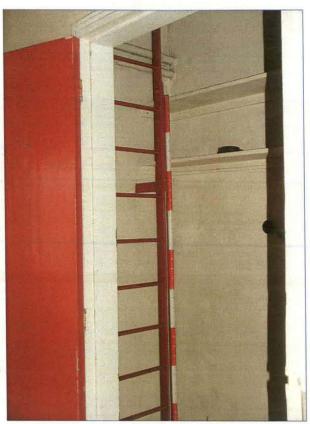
Metal ladder from second floor which provides access to the water tanks and roof (Scale = 2m)
